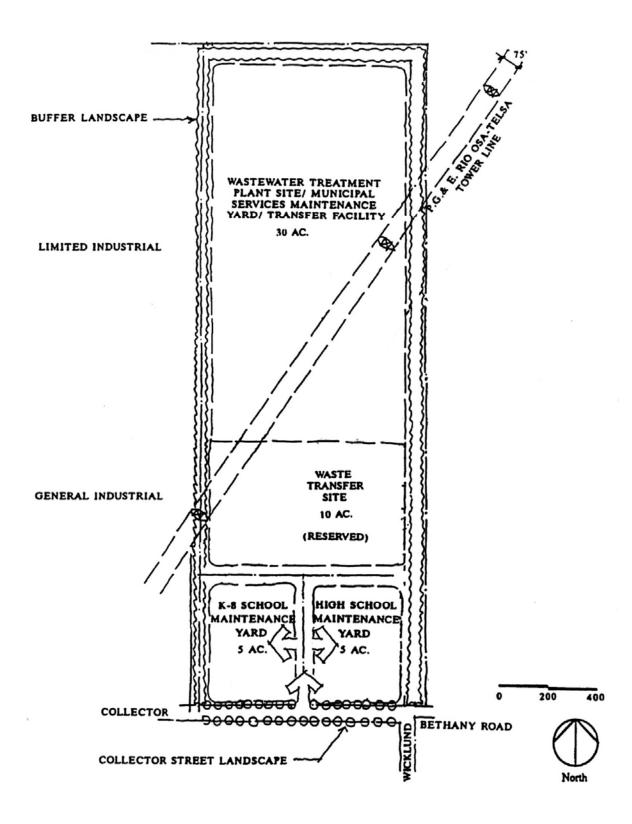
WASTEWATER TREATMENT PLANT SITE LAYOUT
